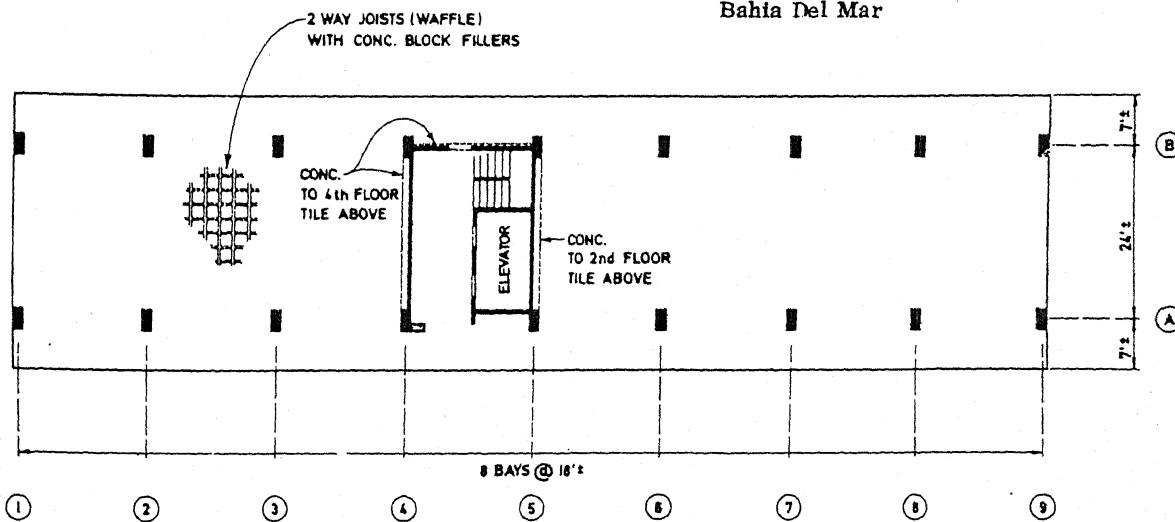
Typical Floor Plan, Bahia Del Mar
